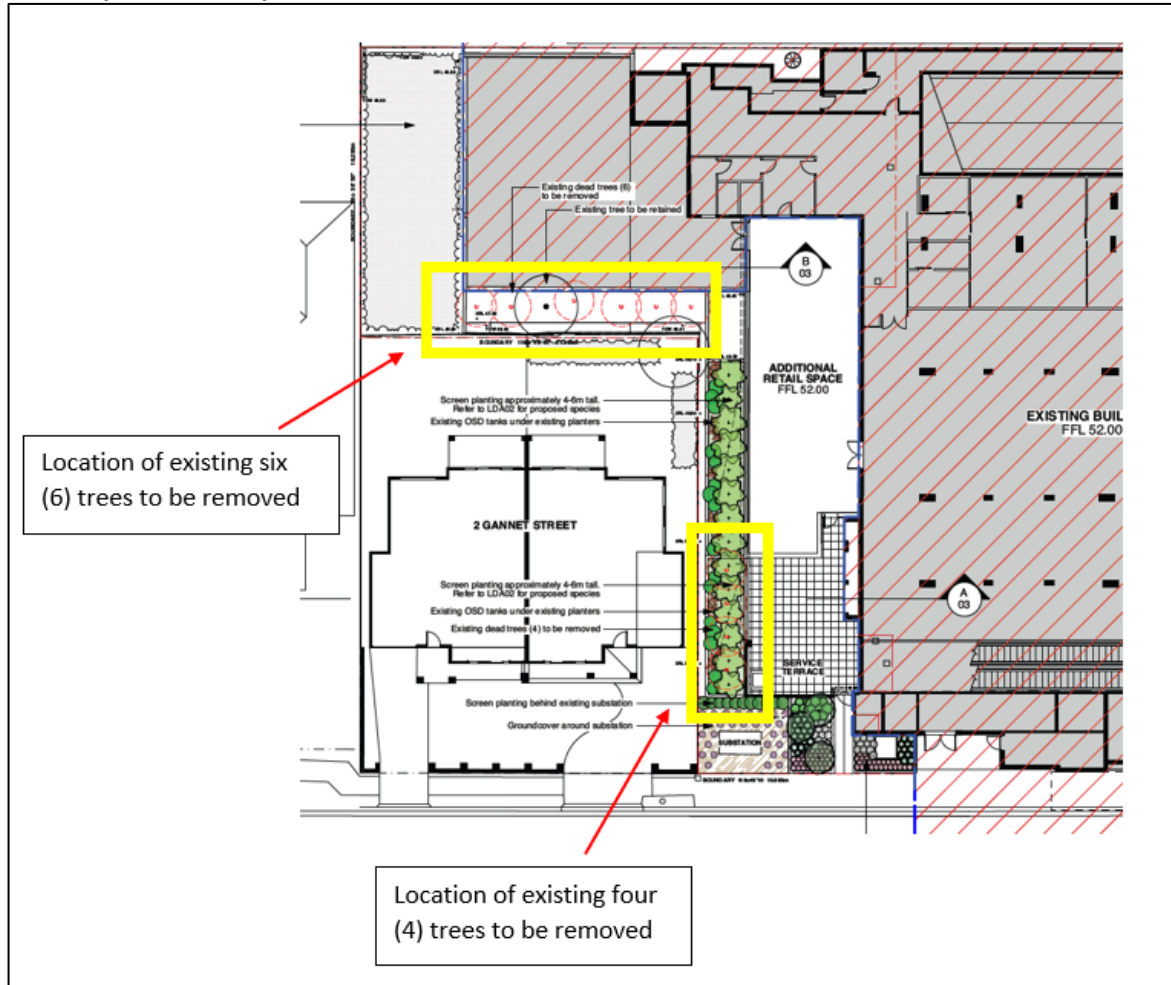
Landscape Plan showing location of existing ten (10) trees to be removed and proposed tree replanting adjacent to the western boundary and within the Gannet Street frontage
